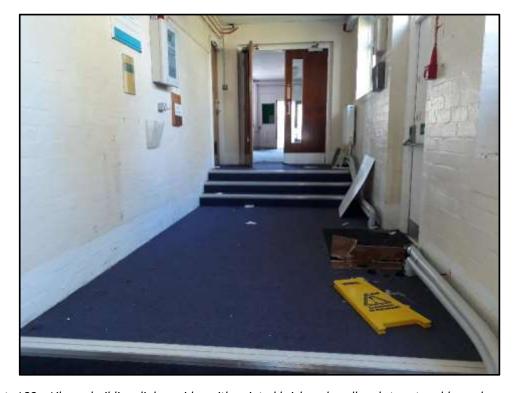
Library building, link corridor with painted brickwork wall and steps to address changes in level between the two ranges (facing south west)
